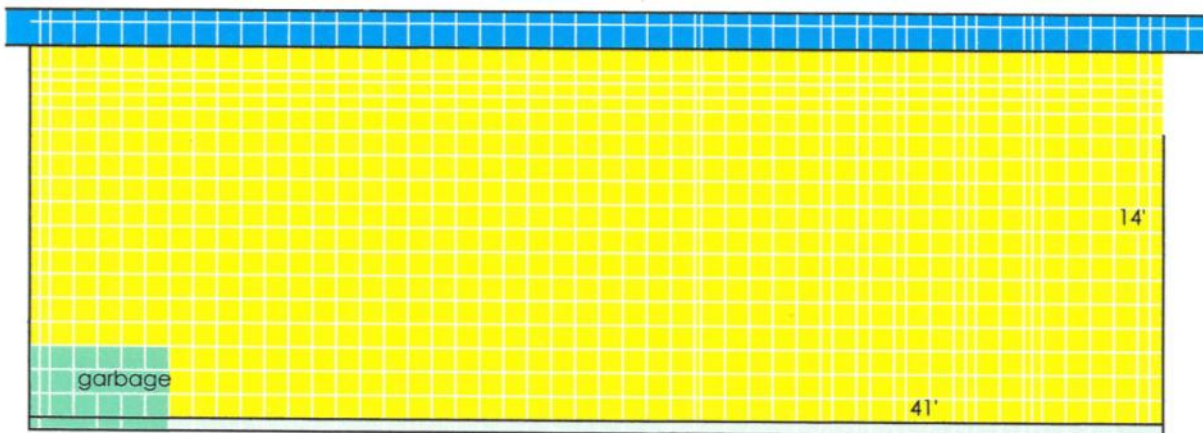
EXISTING/PROPOSED ELEVATIONS
